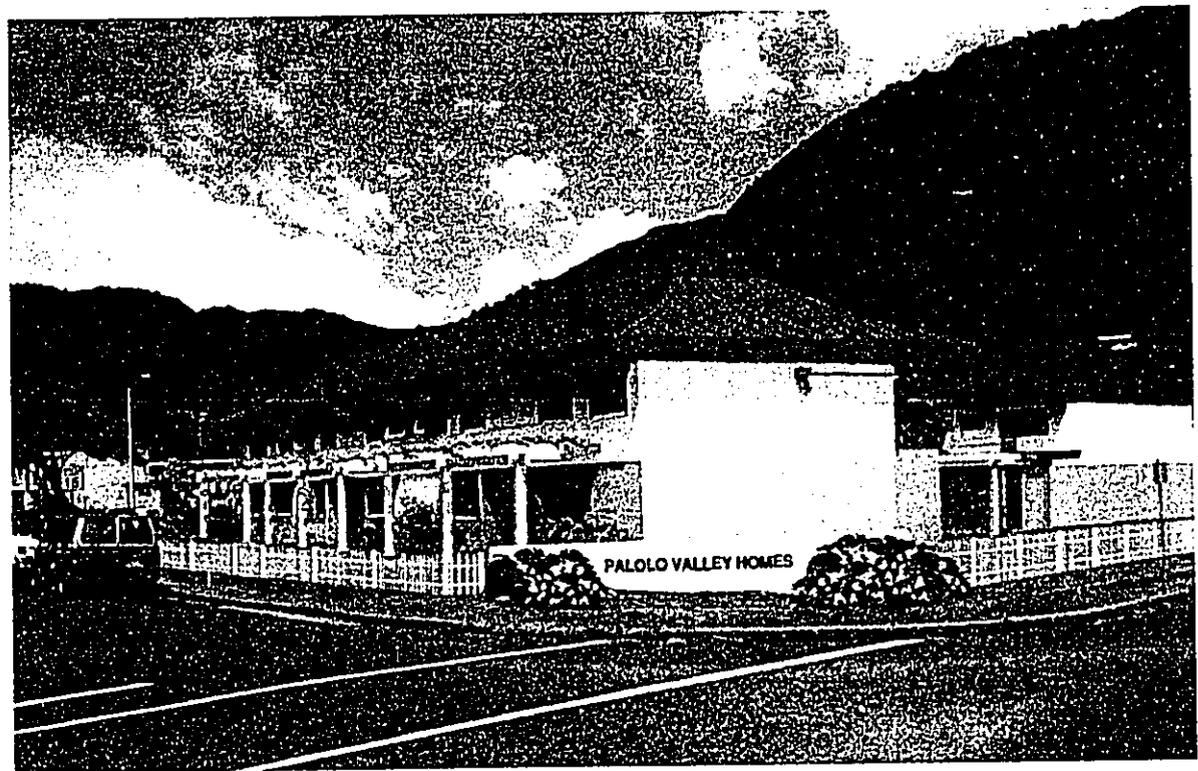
Palolo Valley Homes Building After Renovation (Typical).
